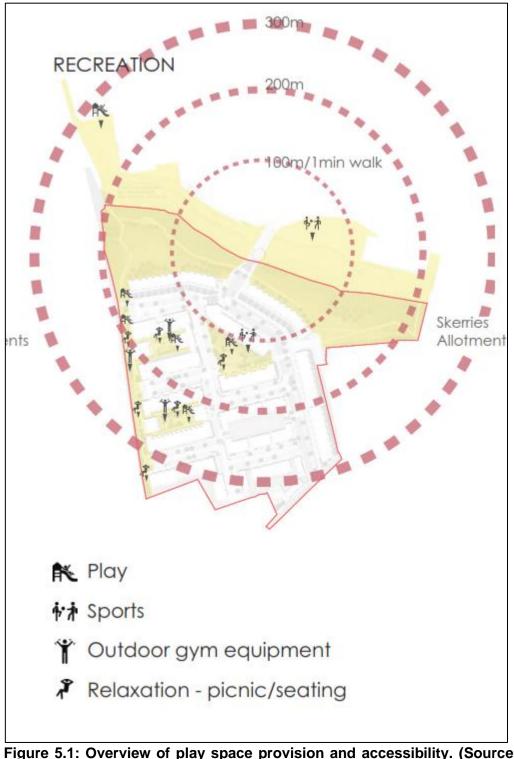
Overview of play space provision and accessibility. (Source: BSLA, 2022)
